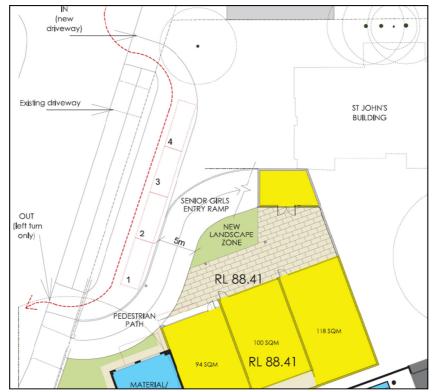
Mayoh Architect's study of on-site pick-up/drop-off facility on Albion Street
